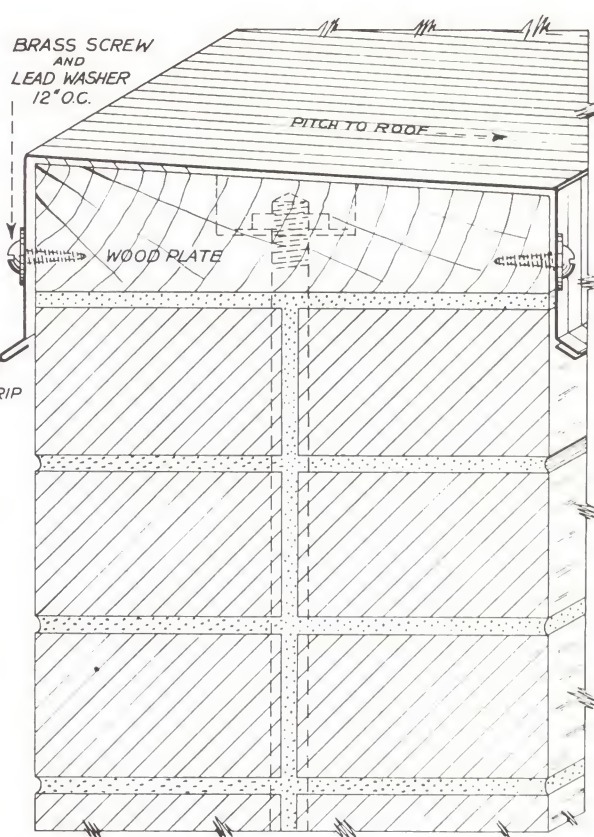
SHEET METAL COPING — ALTERNATE METHOD
